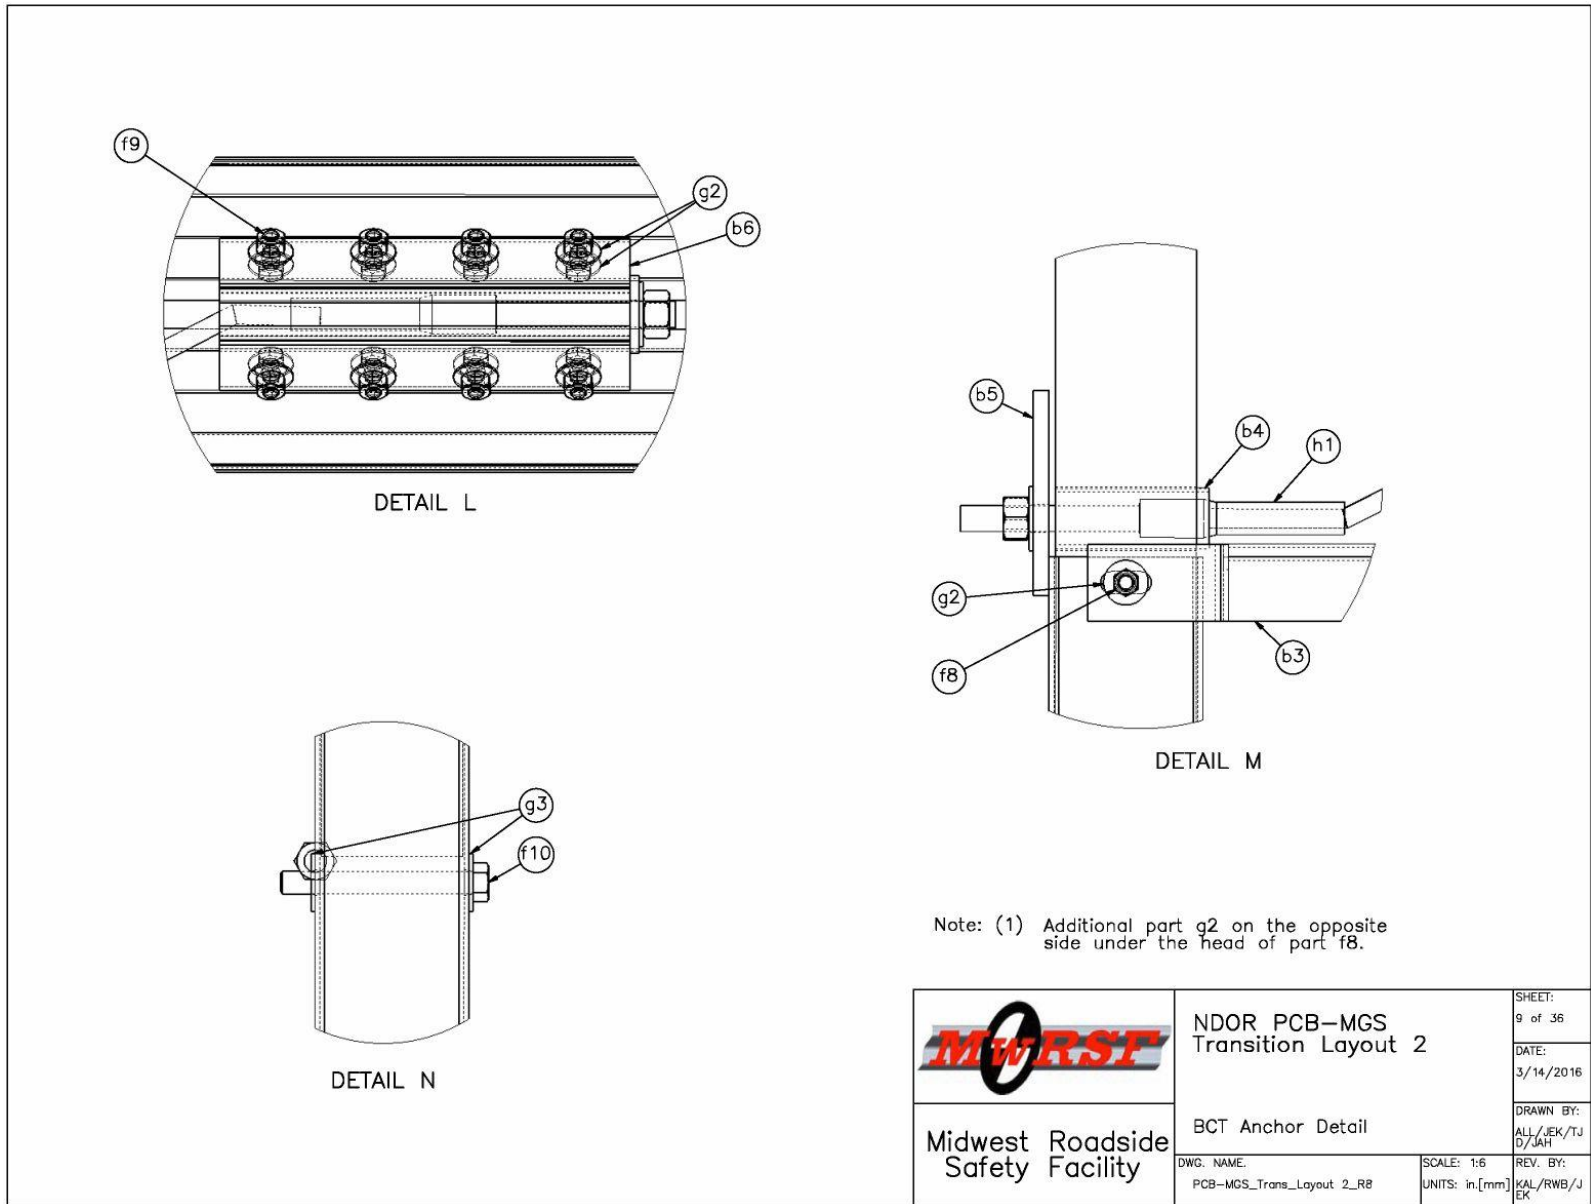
BCT Anchor Detail, Test No. MGSPCB-1
